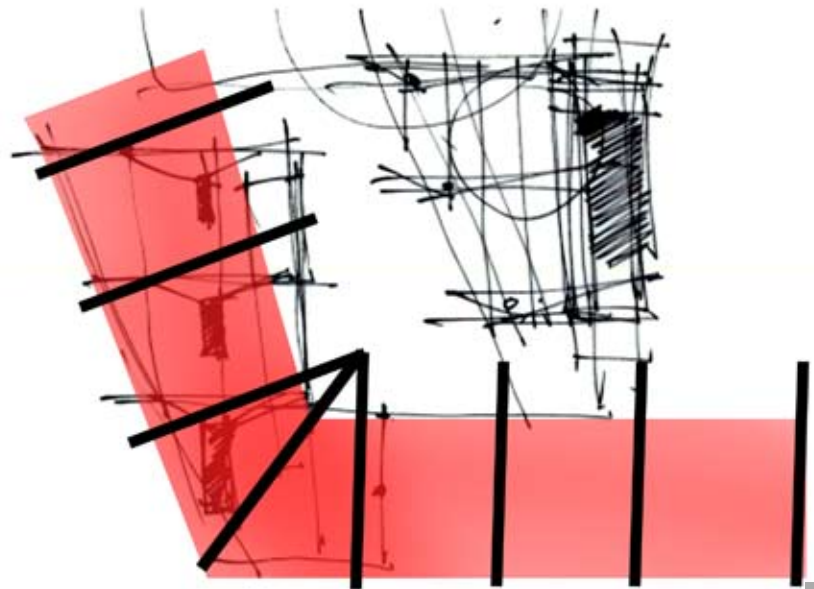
Diagrammatic roof plan of intended truss spacing with resulting roof form
